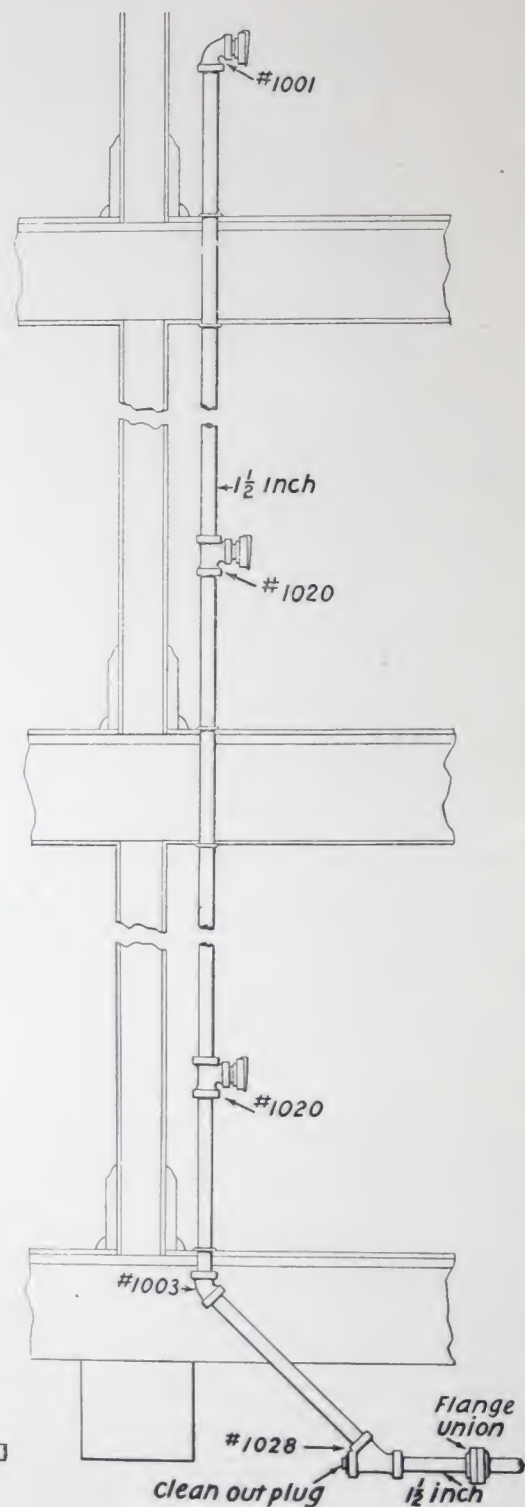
Typical riser, exposed in rooms, with one inlet coupling in each story. Inlet coupling to any riser may be located about 18 inches above the floor, making it easier to attach the hose without stooping.
